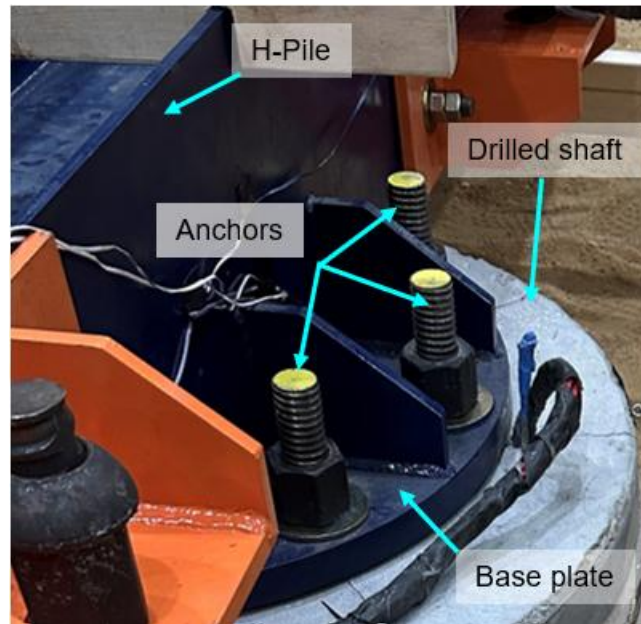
Fitting the plate holes with the anchors sticking out of the drilled shaft surface
